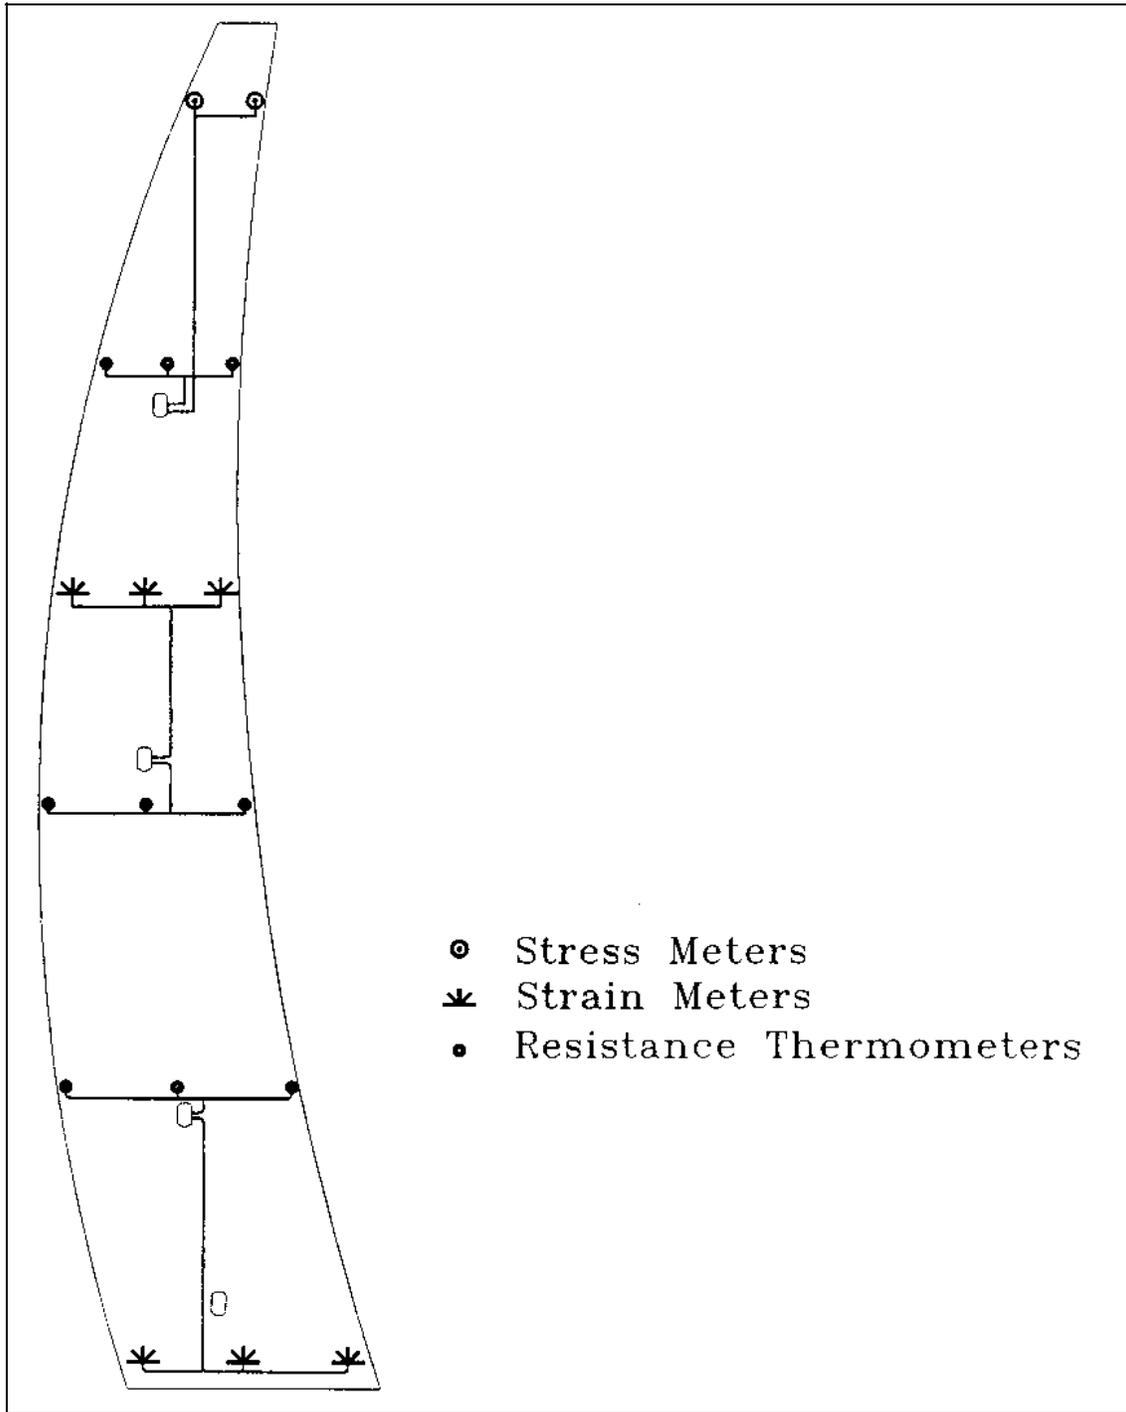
Recommended location of embedded instrumentation in arch dam (section at crown cantilever)
